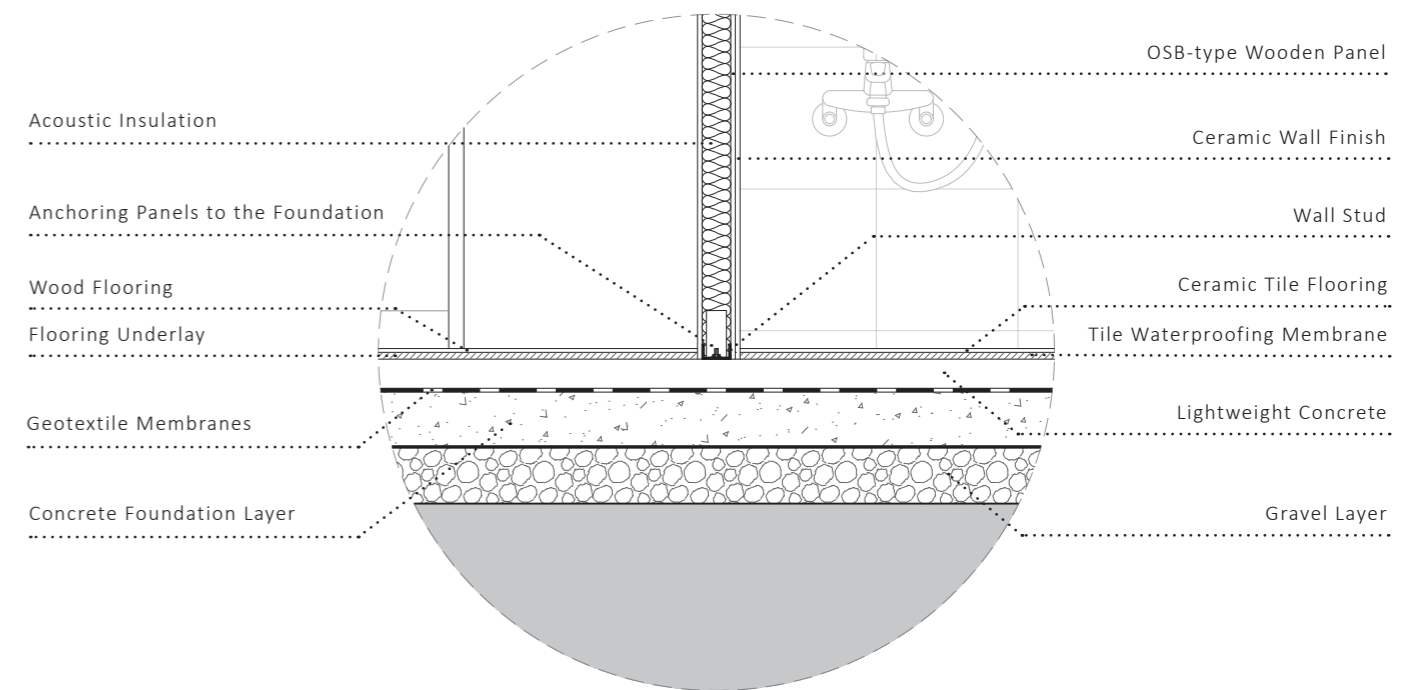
Details Of Steel Frame Construction Method With Passive Design (Strachman,2023).
